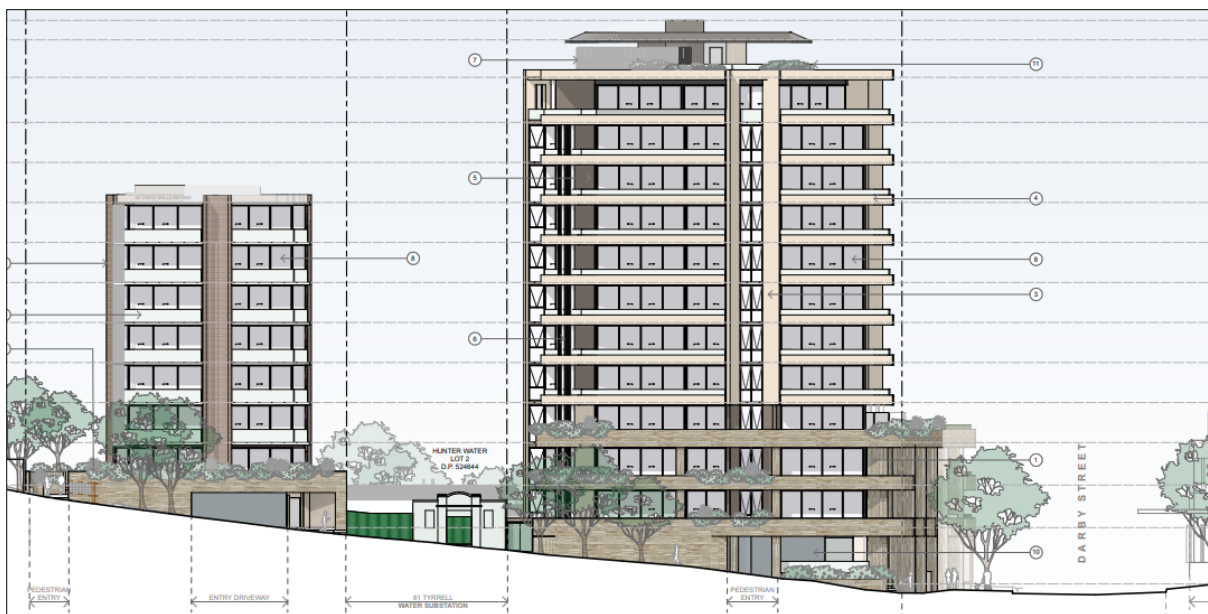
Image from Tyrrell Street northern elevation. Source: CKDS 2025
